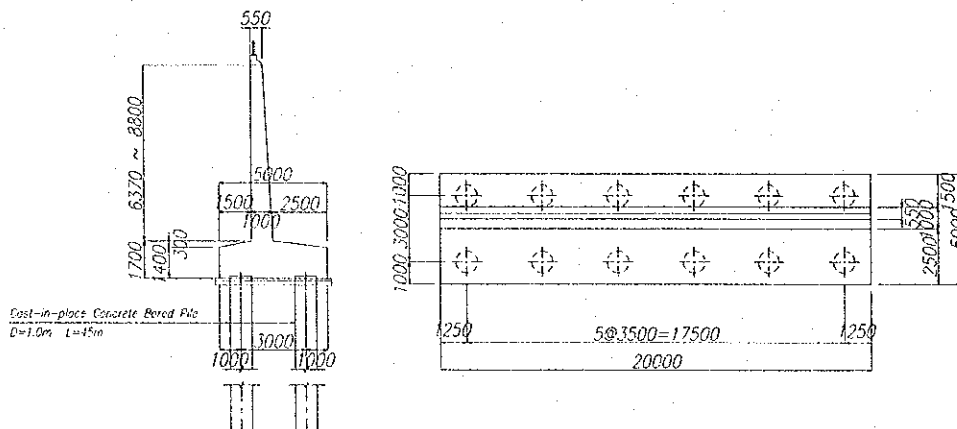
Dimensions and Pile Arrangement of Retaining Wall
